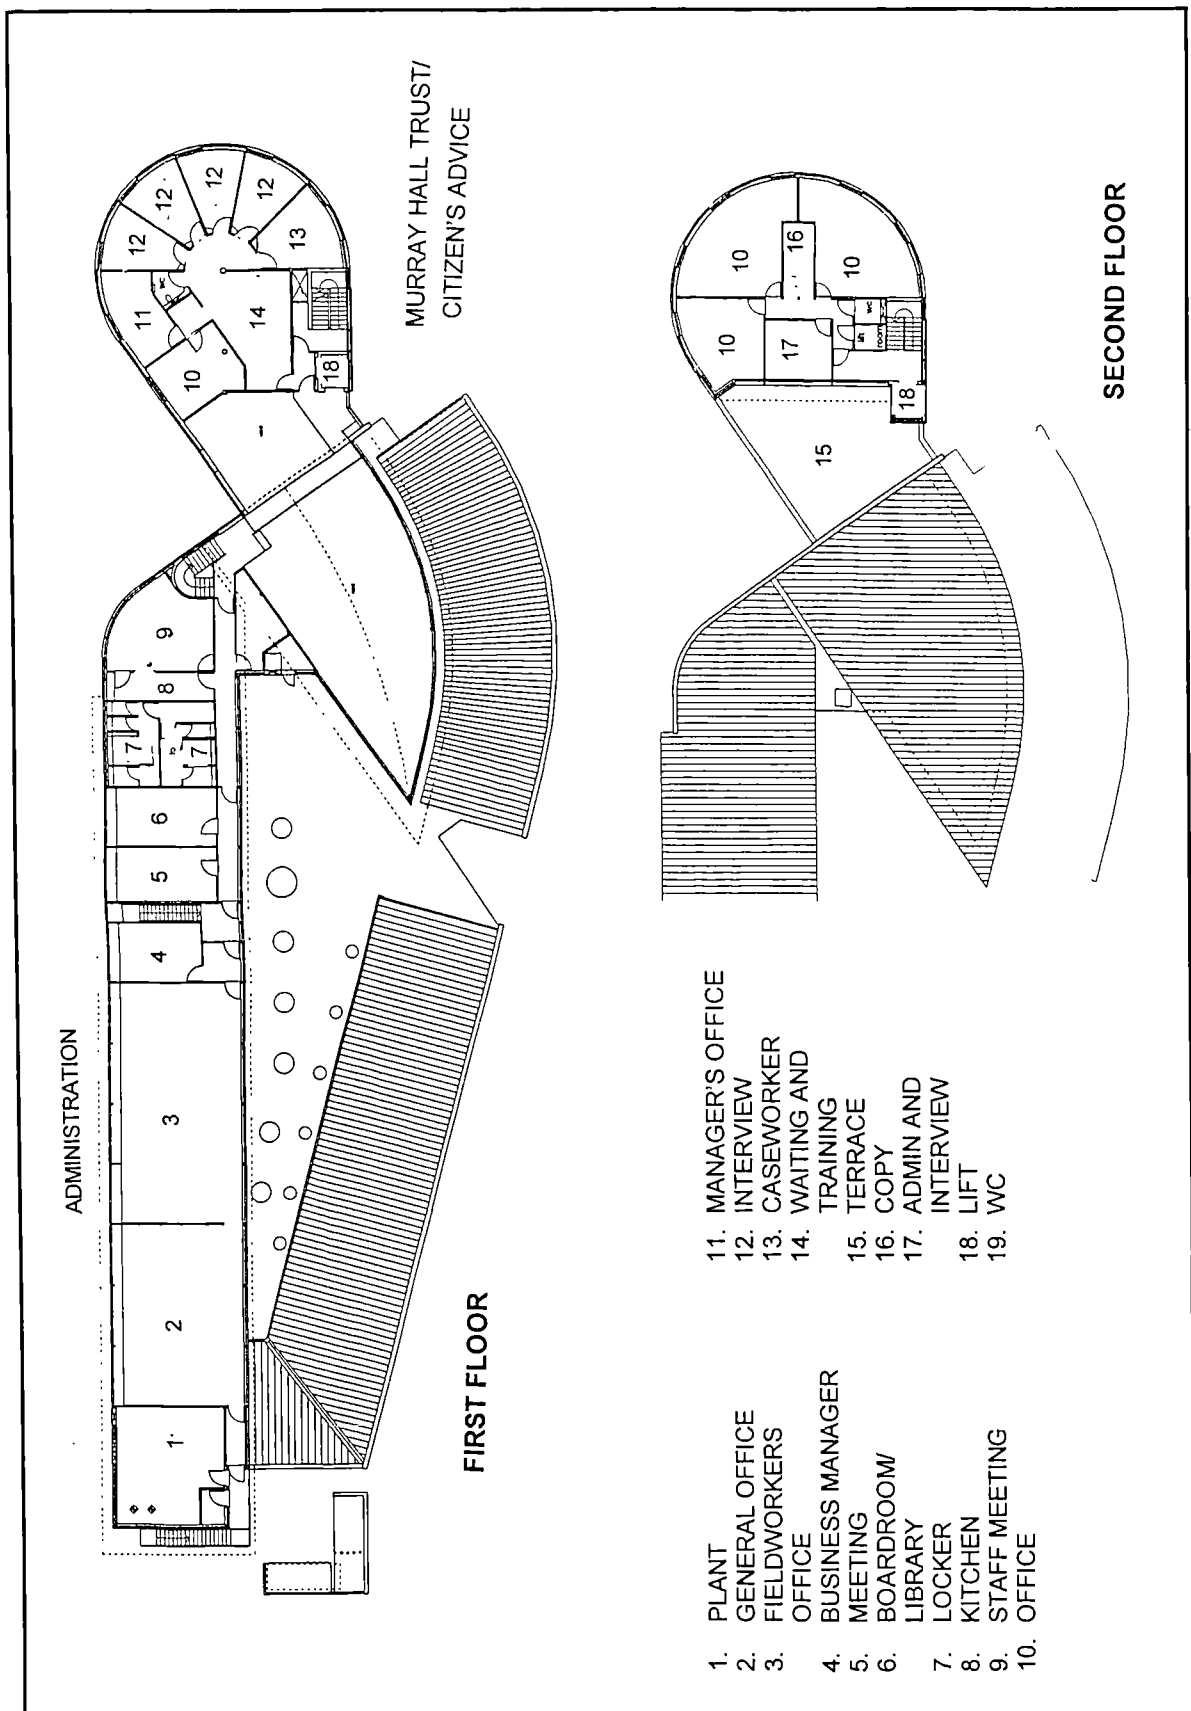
Neptune Health Park: First and Second Floor Plans Architects: Penoyre & Prasad
